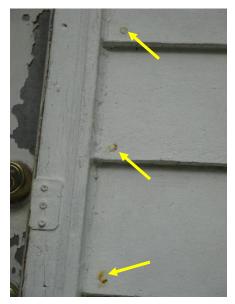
Localized ferrous staining due to exposed nails in the siding on south facade.
